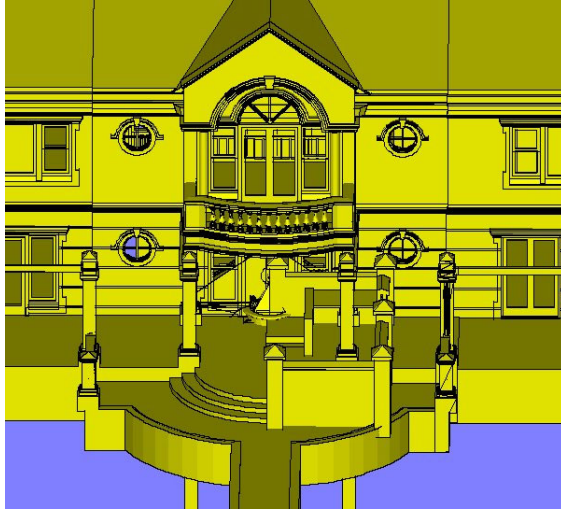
Close up View of Entrance Details Which Posed a Major Challenge to RP above Conventional Model Building Techniques
